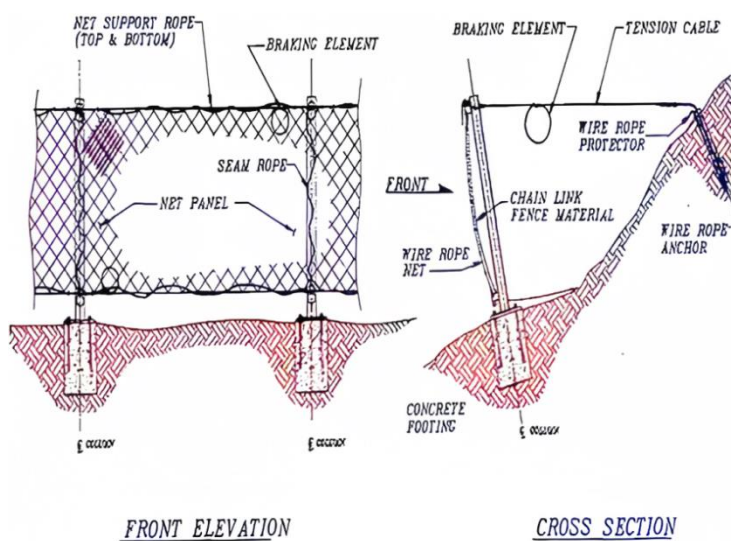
Typical Layout, Wire Rope Net Barrier System
